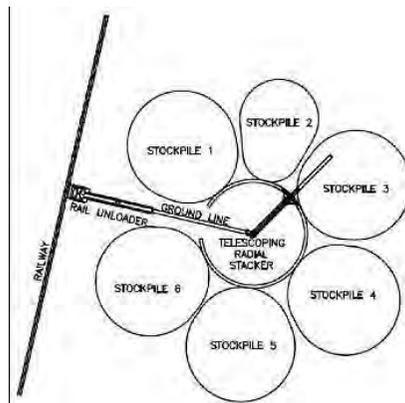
Ideal Layout for an Unload/Re-load Site
